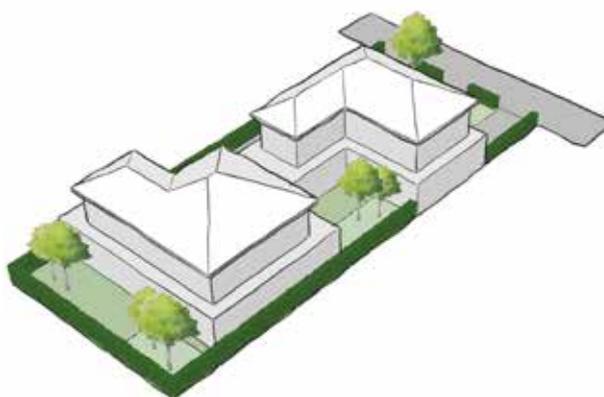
Typical dual occupancy constructed with the new 35% minimum garden area requirement.
